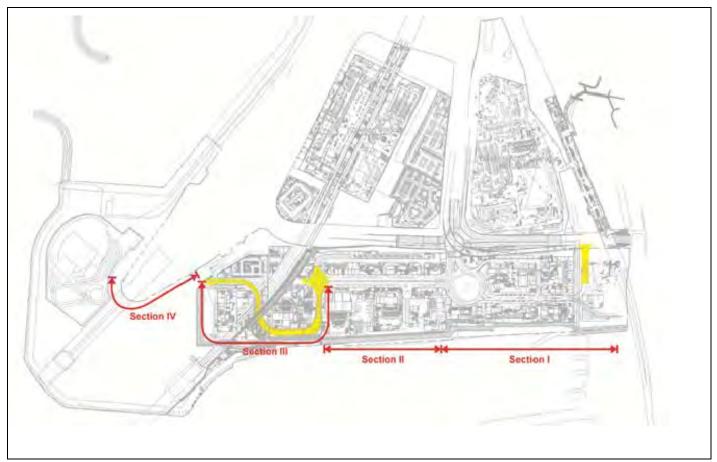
Level +0.6mPD to +1.65mPD Layout Plan – Basement 1 Circulation (Phase 1)
